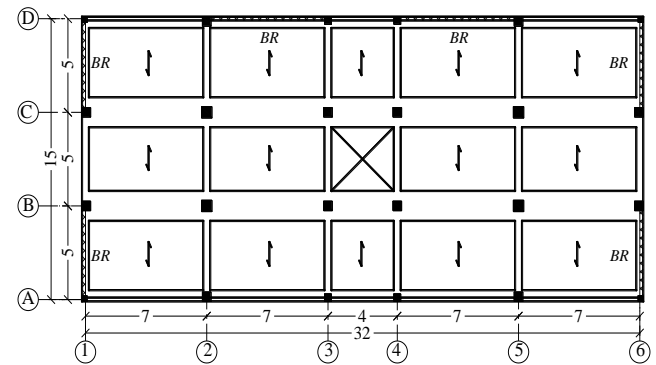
Plan of the retrofitting system: Steel chevron bracing (BR)
